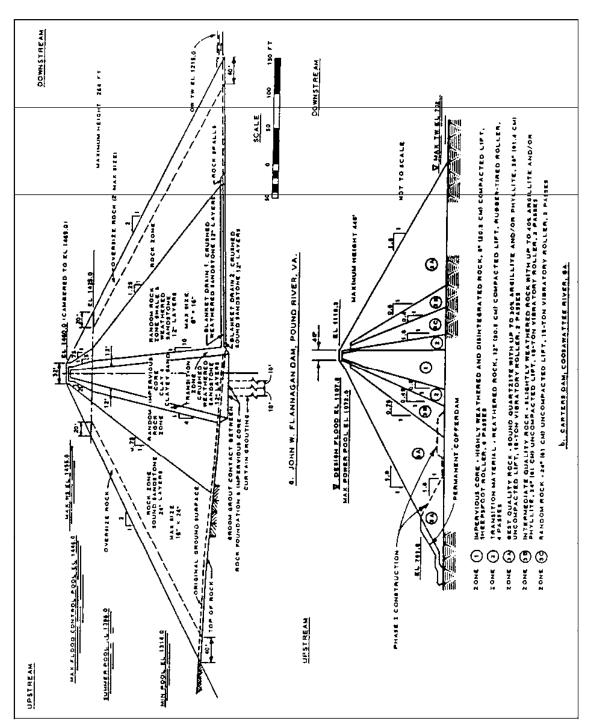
Embankment sections, rock-fill dams (John W. Flannagan and Carters Dams)
